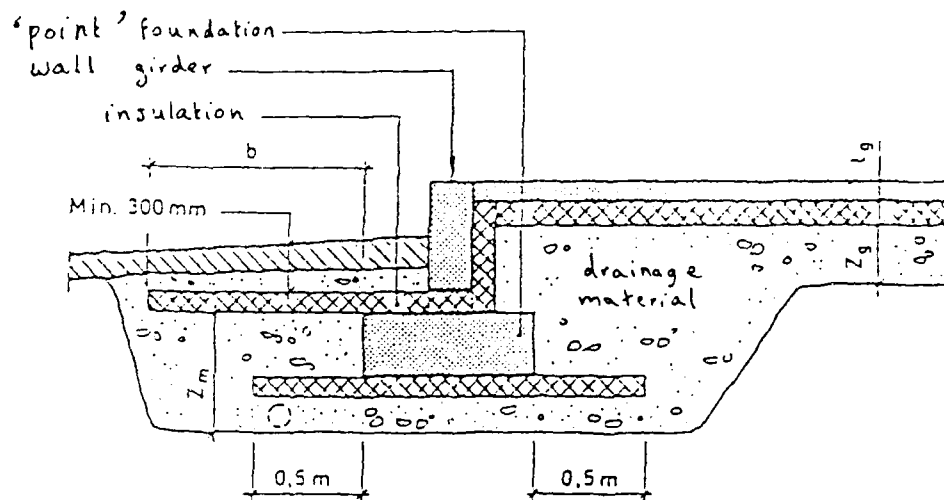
Frost protection : Foundation for large loading. Without inner formwork.
